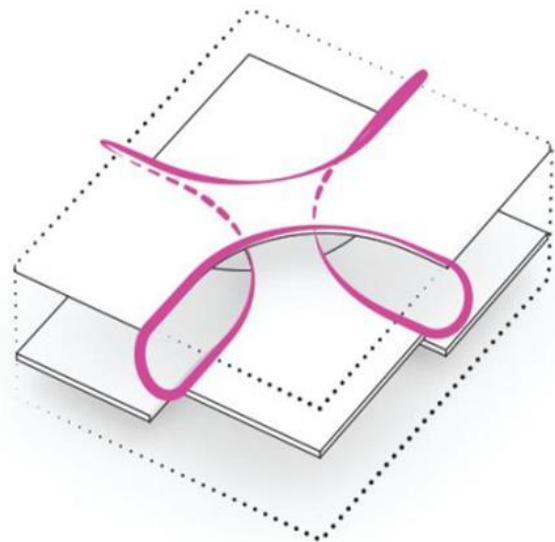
Architectural and structural plan of project area, bridge and atrium stairs (Fig. left. Copyright © Hema).
